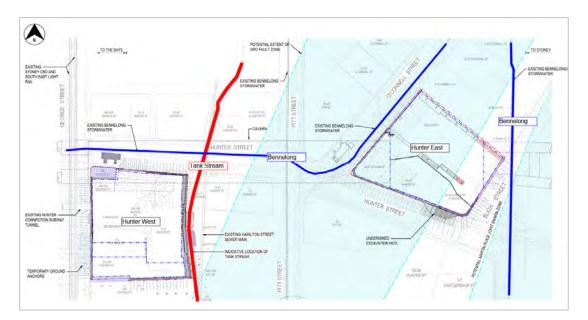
Sydney Water Assets near the Hunter Street Station cavern and stub tunnels
